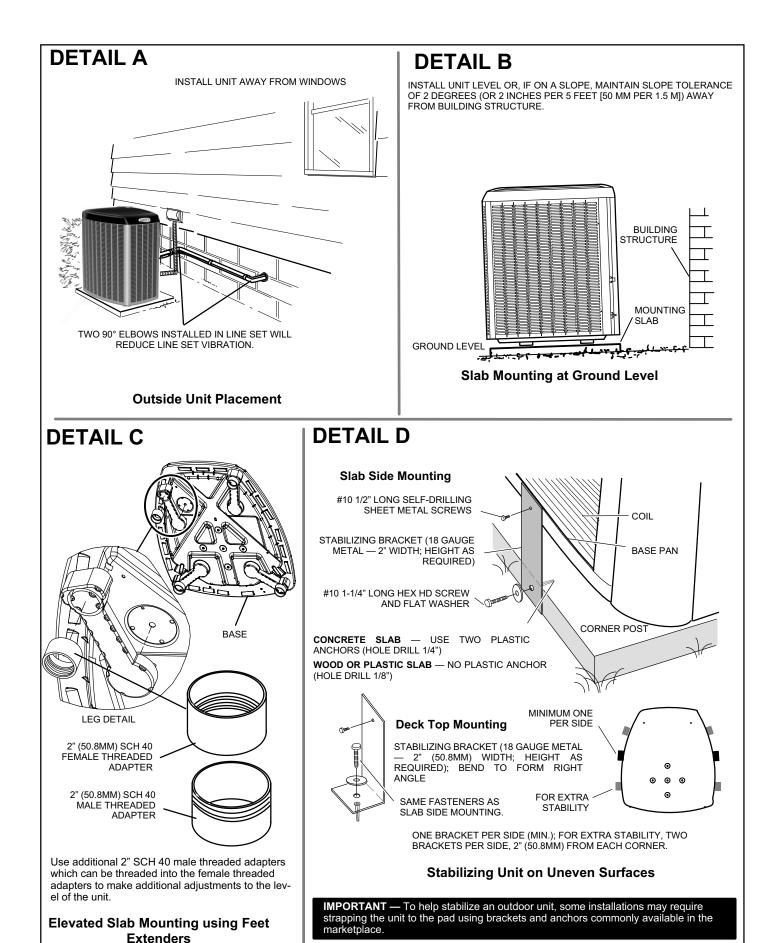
Placement, Slab Mounting and Stabilizing Unit
